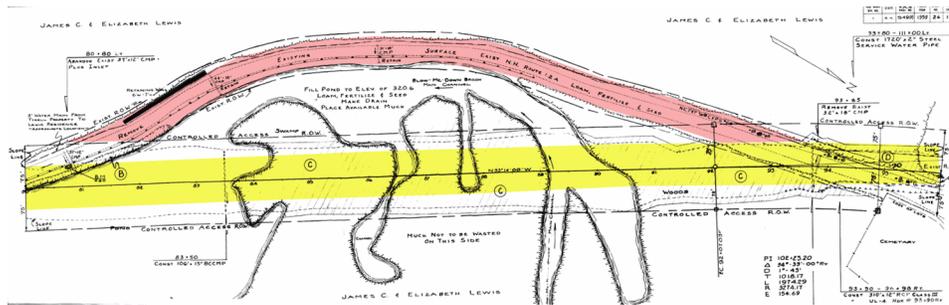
Detail of a plan for the road realignment along Route 12A, 1958. The old roadbed is shaded pink and the new road is shaded yellow. Image courtesy of the New Hampshire Department of Transportation.
